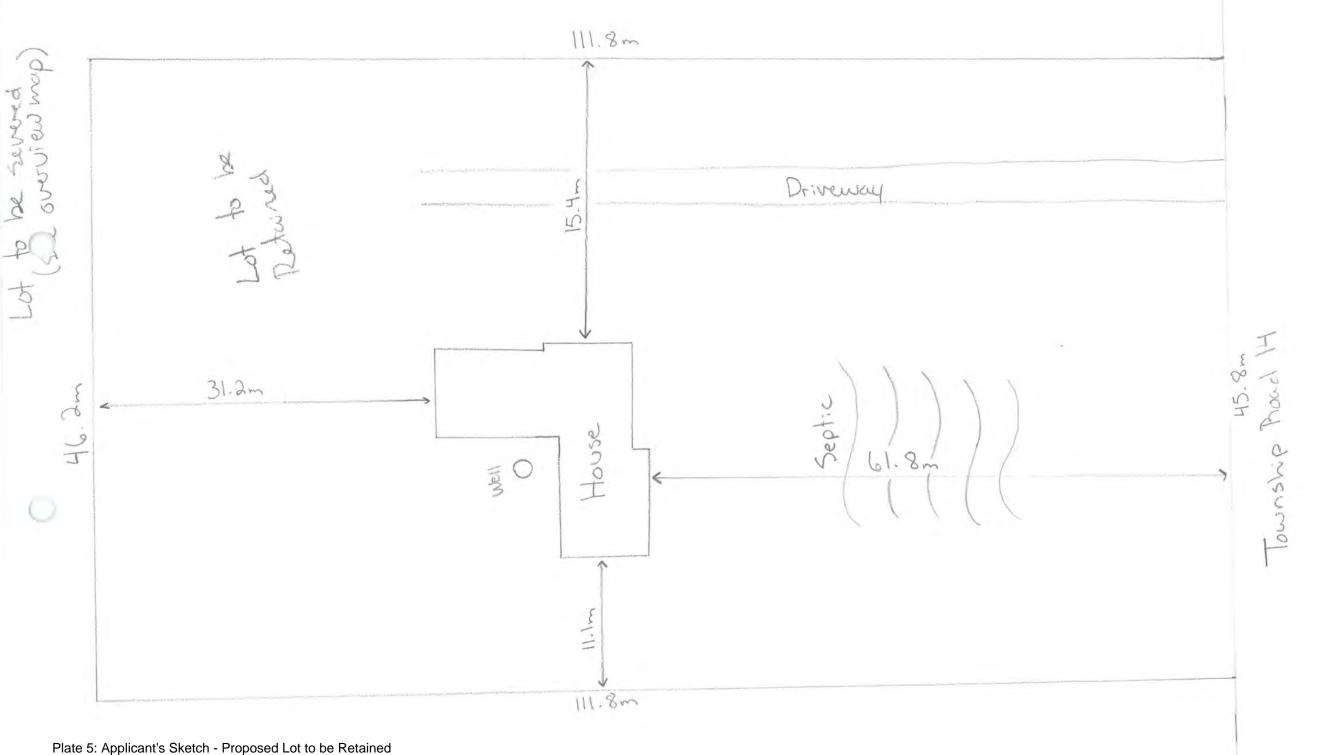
Applicant's Sketch - Proposed Lot to be Retained File No. B24-54-1 (Heeg Dairy Inc.)
